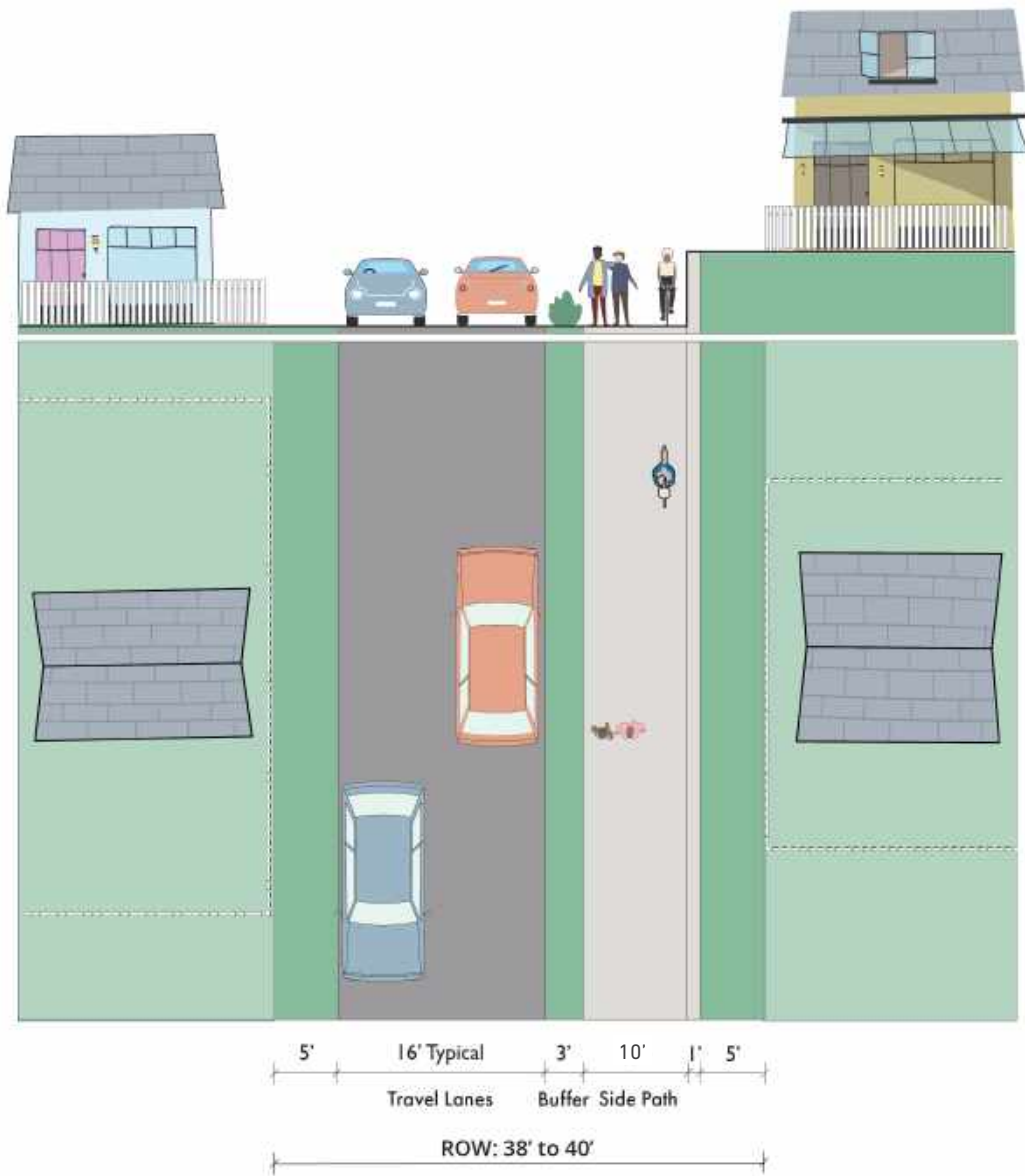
TYPICAL PROPOSED SECTION - WHITE STREET
